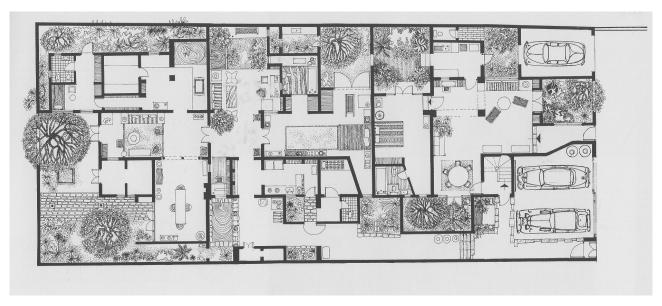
Geoffrey Bawa - Plan of 33rd Lane Columba
